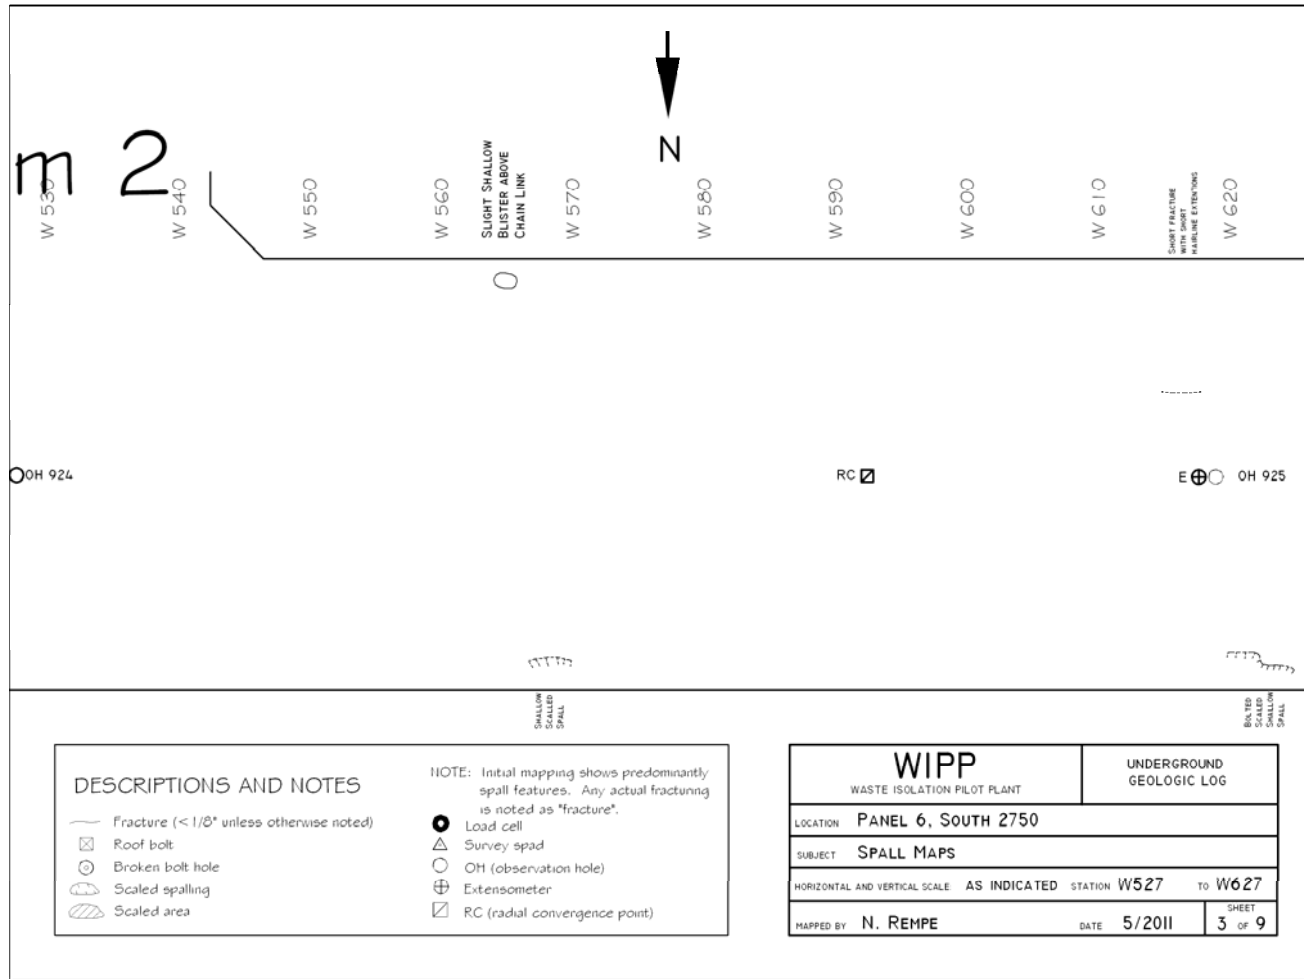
Panel 6 S2750, W390-W1210 Roof Fractures (Sheet 3 of 9)
